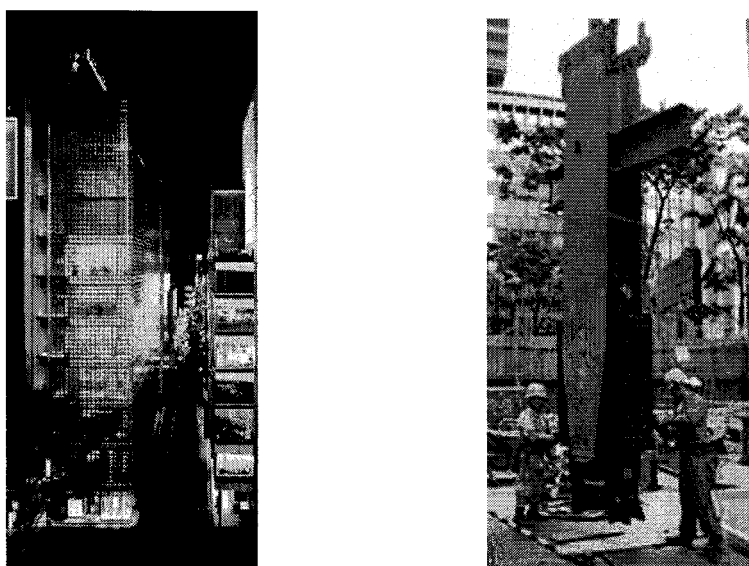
Maison Hermes Building, Tokyo and uplifting column base installation
